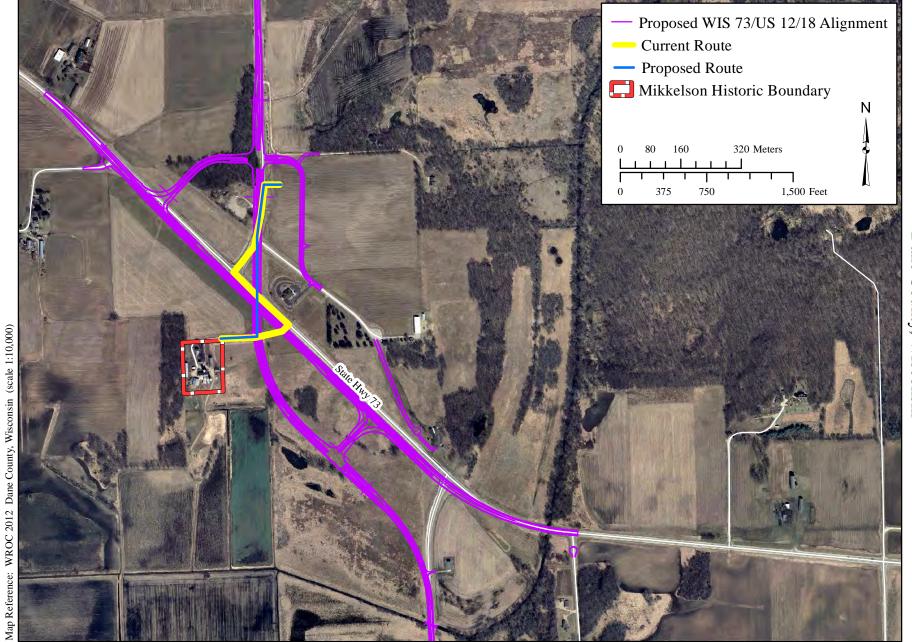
Current and Proposed Access to Fields North of Mikkelson Farmstead.
